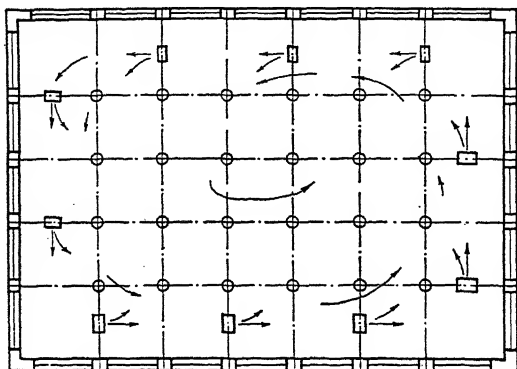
Typical Location of Small Over-Head Type Unit Heaters for One Large Room
